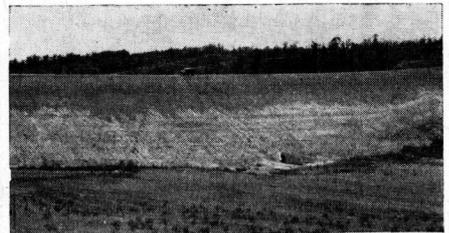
Same Culvert as in Figure 1 after Fill was Completed. Important details which influence loads are covered up.
